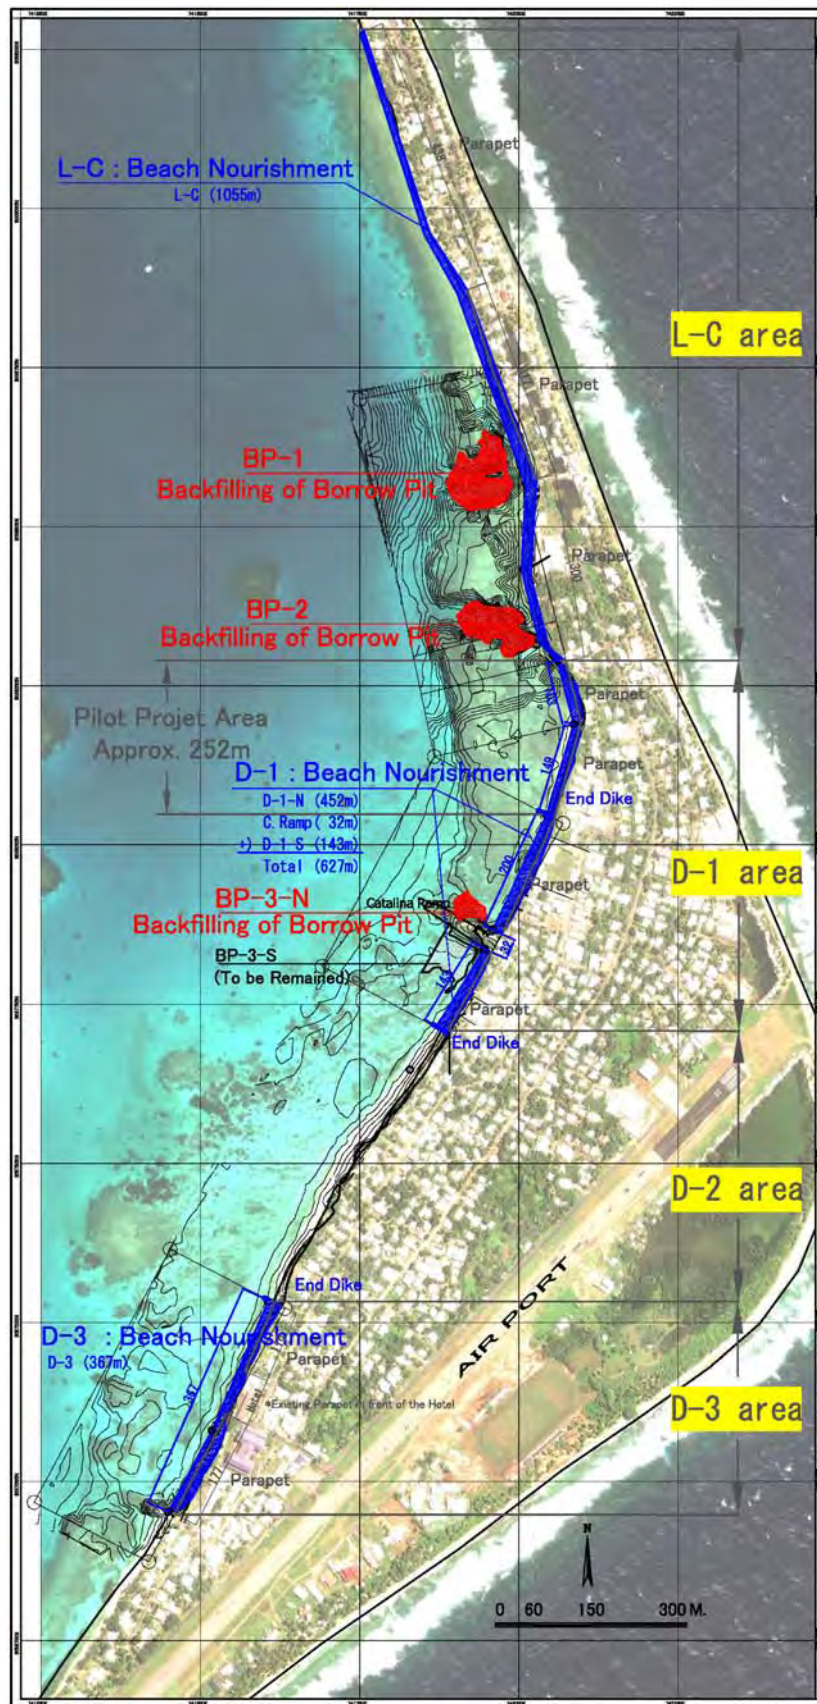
Plot Plan of Proposed Coastal Protection Measures
